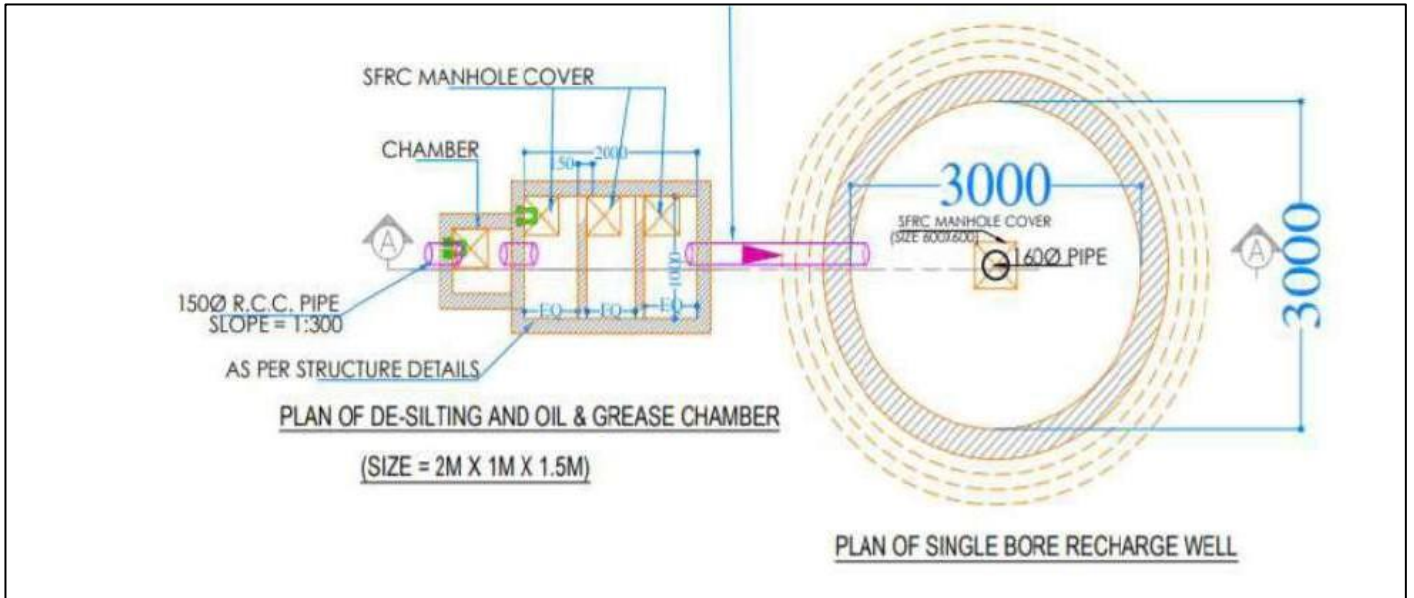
(A)-TYPICAL HORIZONTAL SECTION OF RAIN WATER HARVESTING PIT
